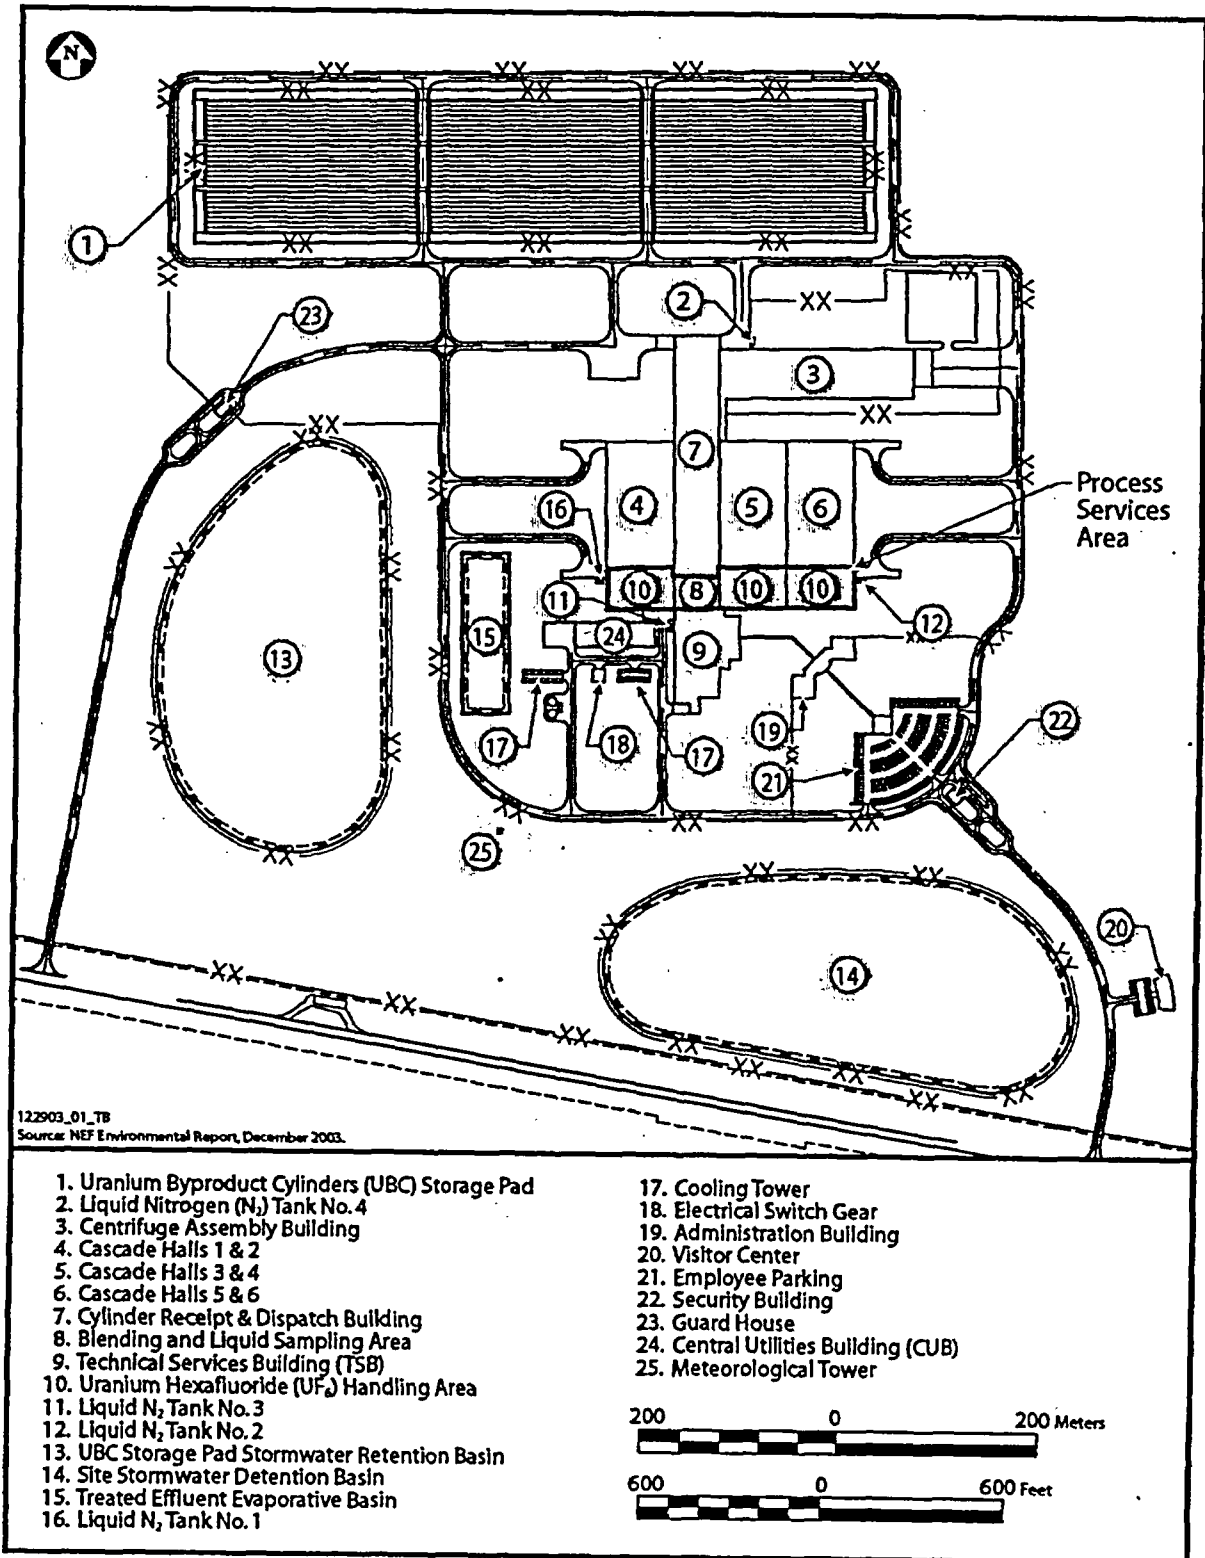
Proposed NEF Site Layout (LES, 2004a)
